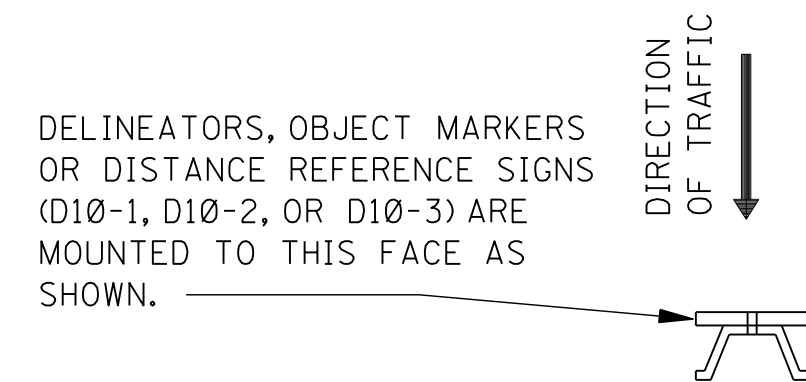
OBJECT MARKER INSTALLATION
